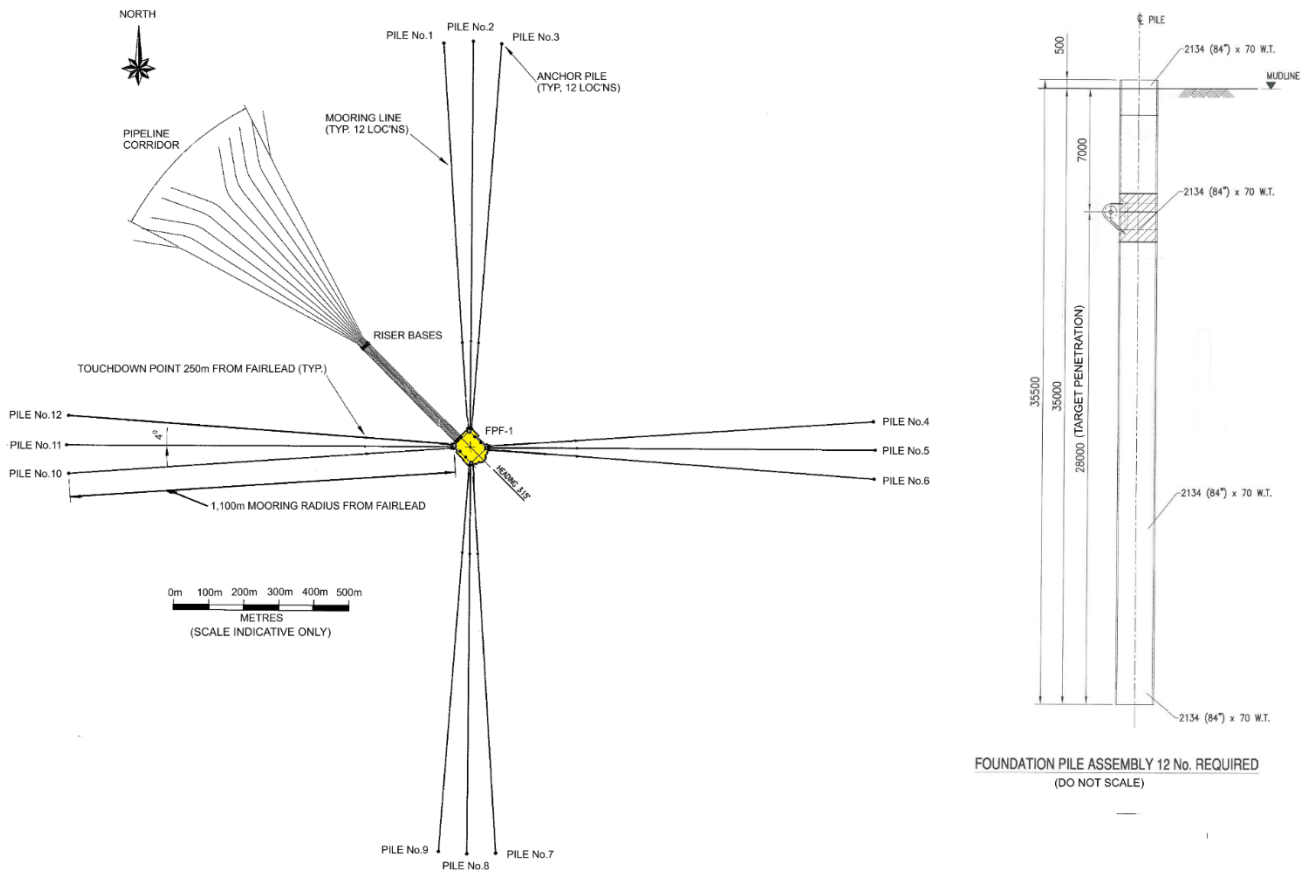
Stella FPF-1 – mooring anchor pattern and anchor pile profile
